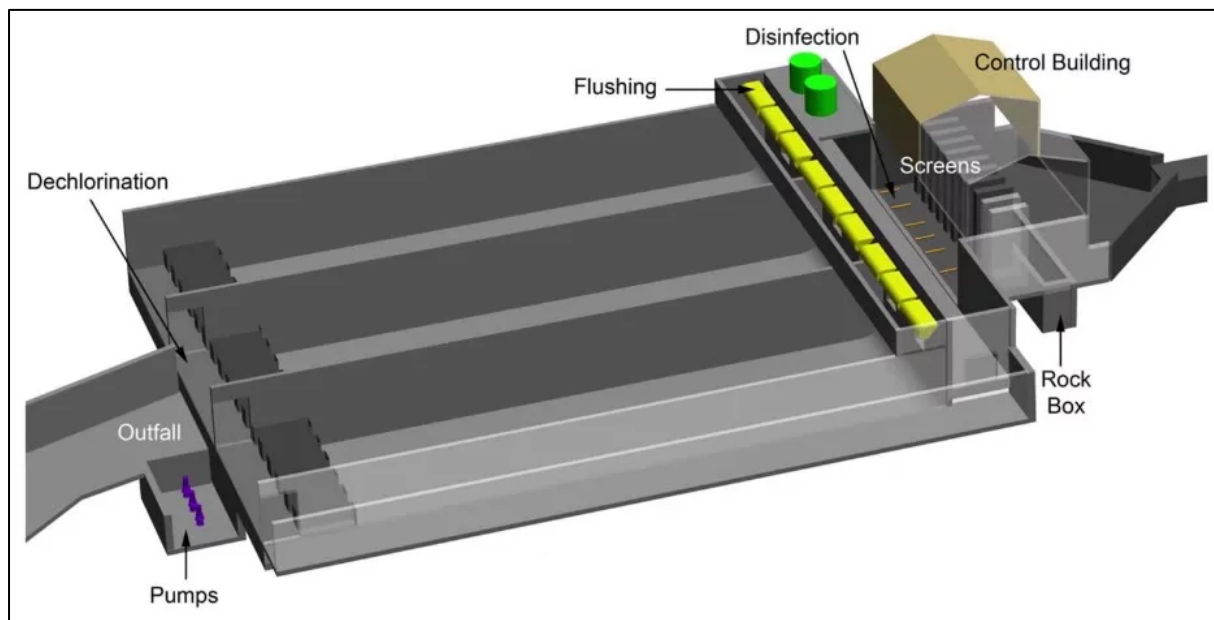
Typical Retention Treatment Basin Facility Layout
